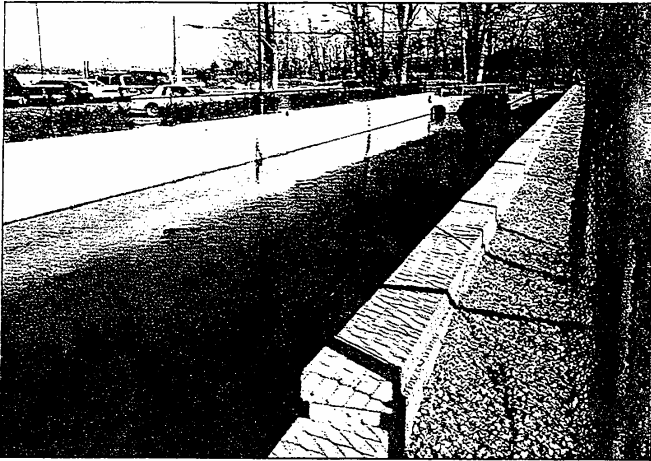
Concrete Retaining Wall (Source: Land and Water Magazine)
